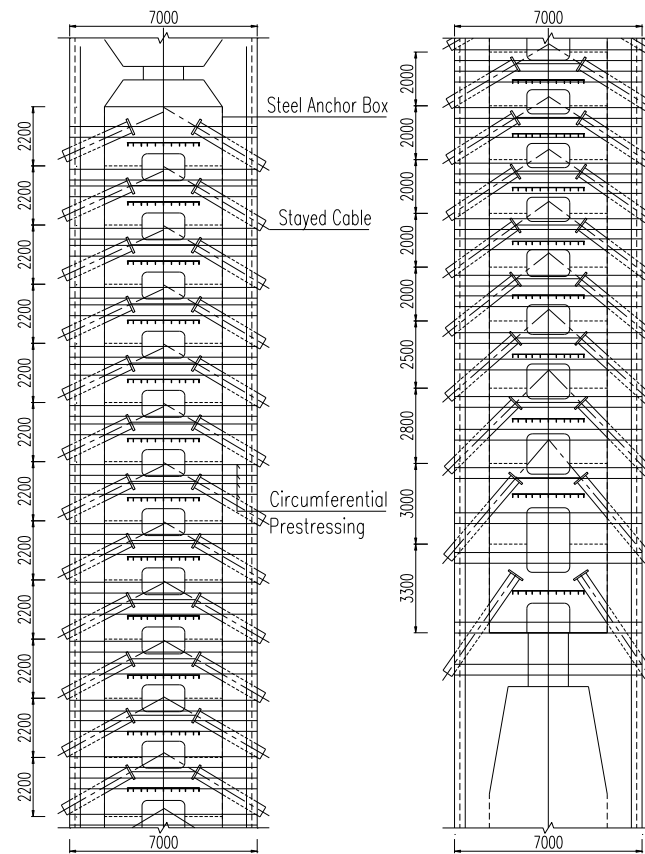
Elevation diagram of the steel anchor boxes and circumferential prestressing of the Huaizhou Tuojiang Bridge (Unit: mm)
